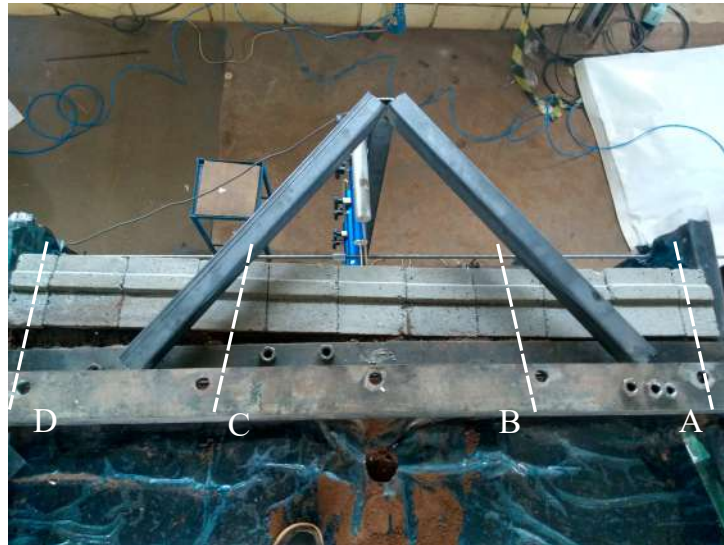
Top view of the wall facing showing the D section with larger outward deflection (left on the image).
